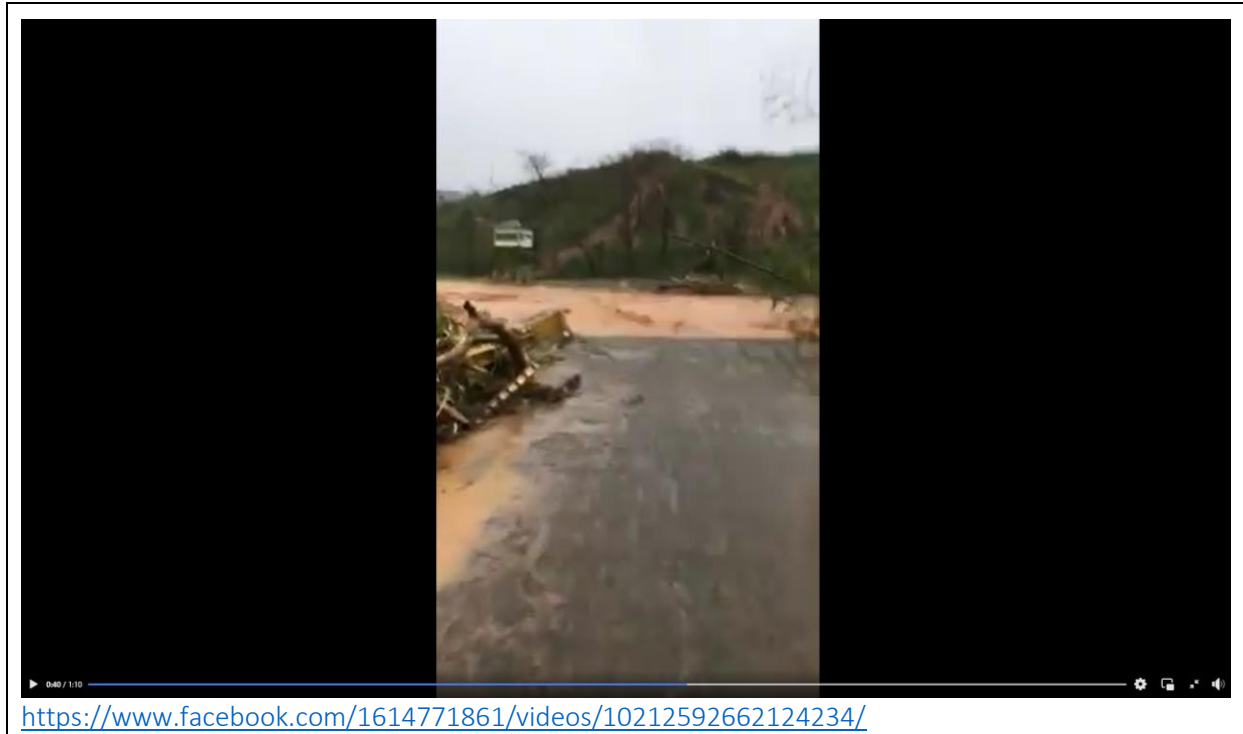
Collapsed Bridge 1462 image from news report (source: New York Post)
